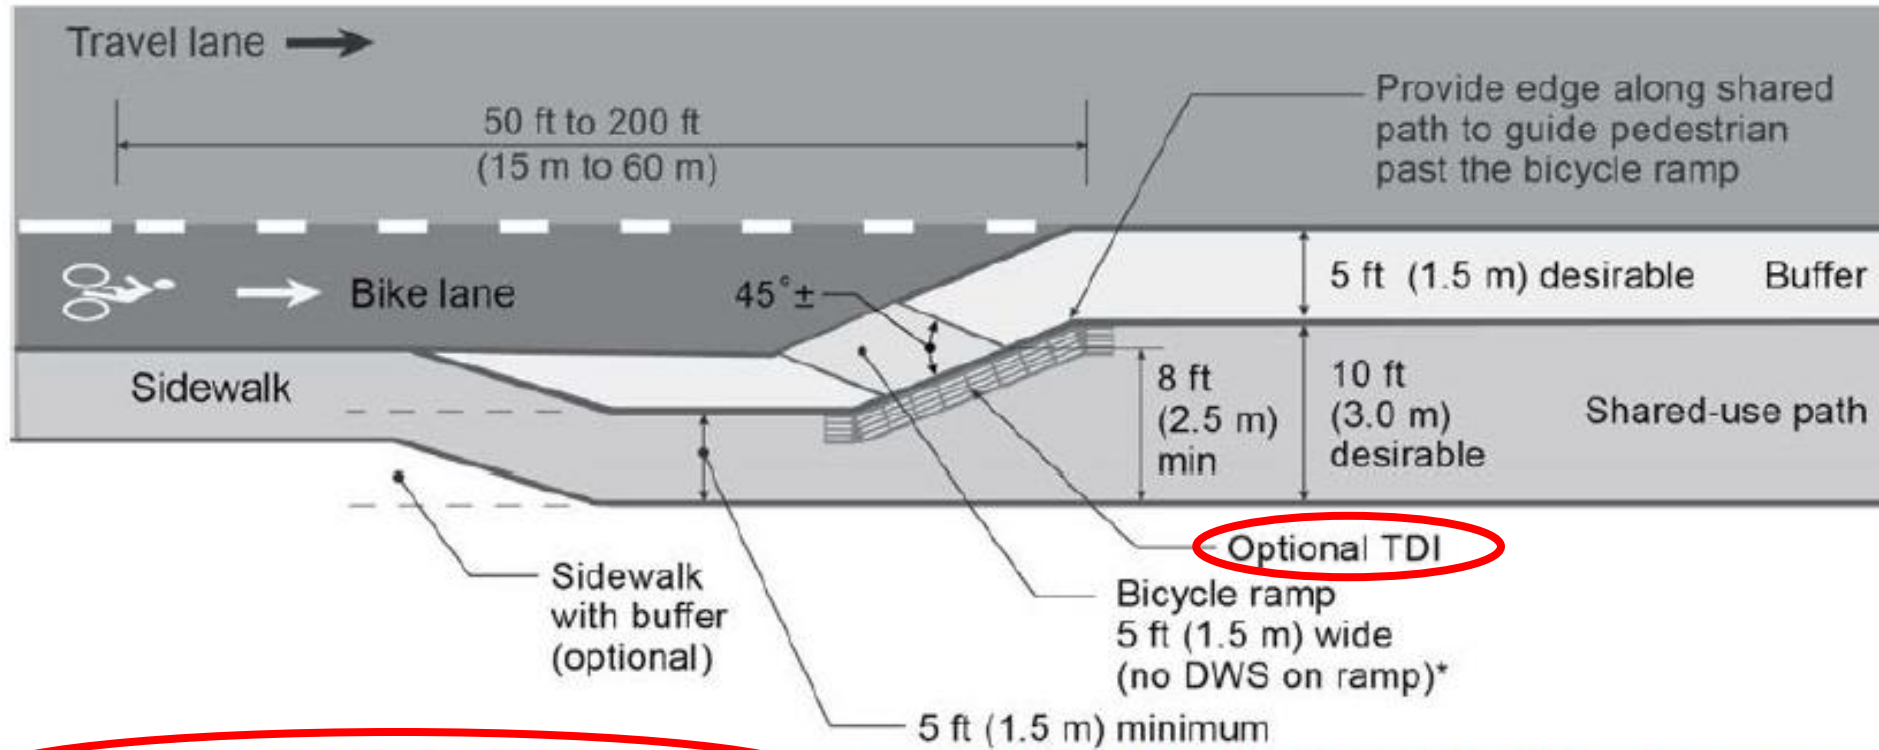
Typical Layout of Bike Lane Transitions to Shared Use Path at Multilane Roundabout with Bike Ramps
